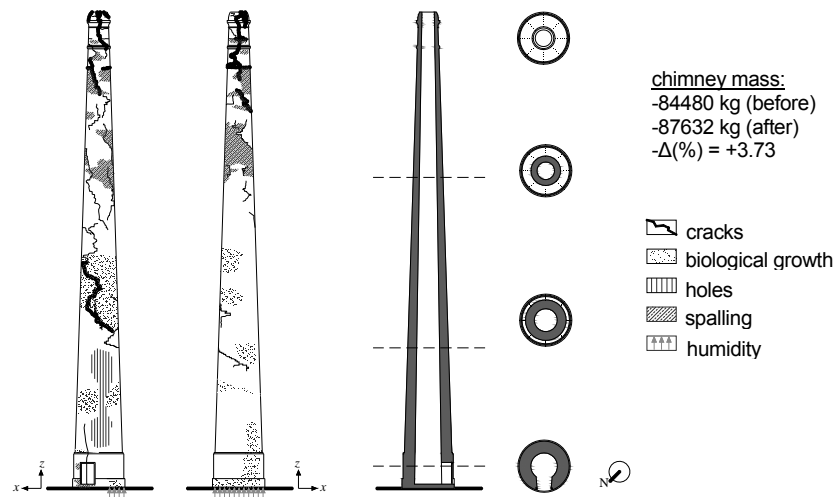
Geometrical survey and damage pattern in the chimney: West front, East front, sections.
